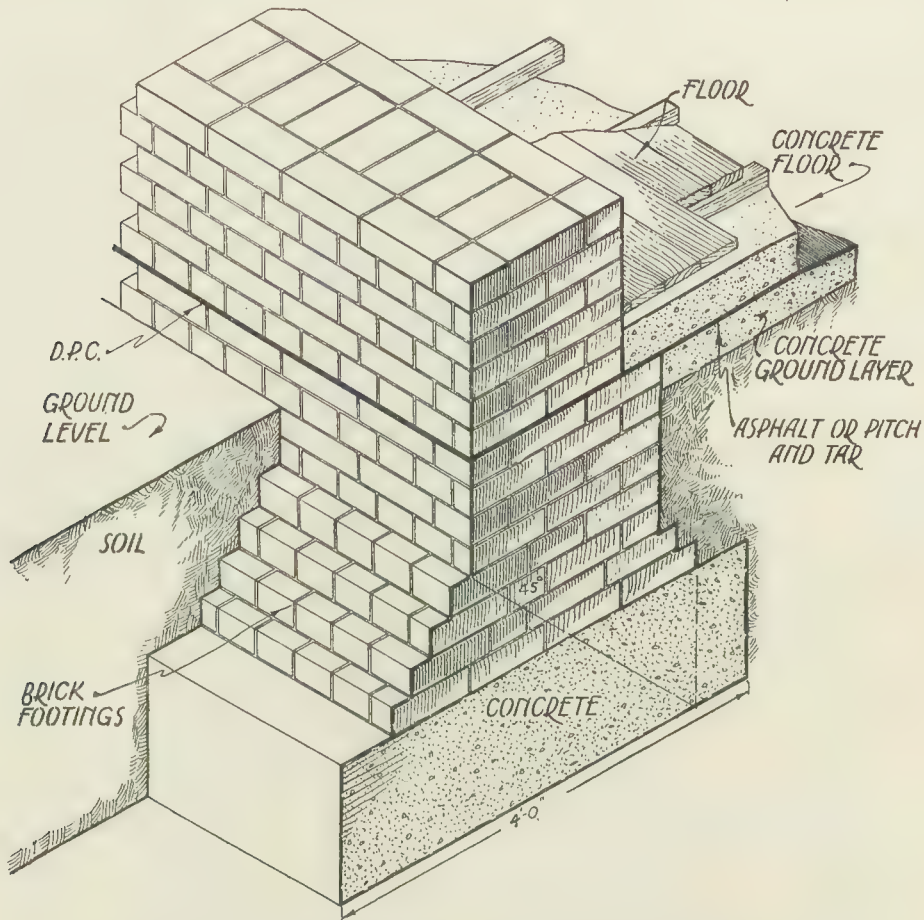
TYPICAL CONCRETE FOUNDATIONS FOR A BRICK WALL
